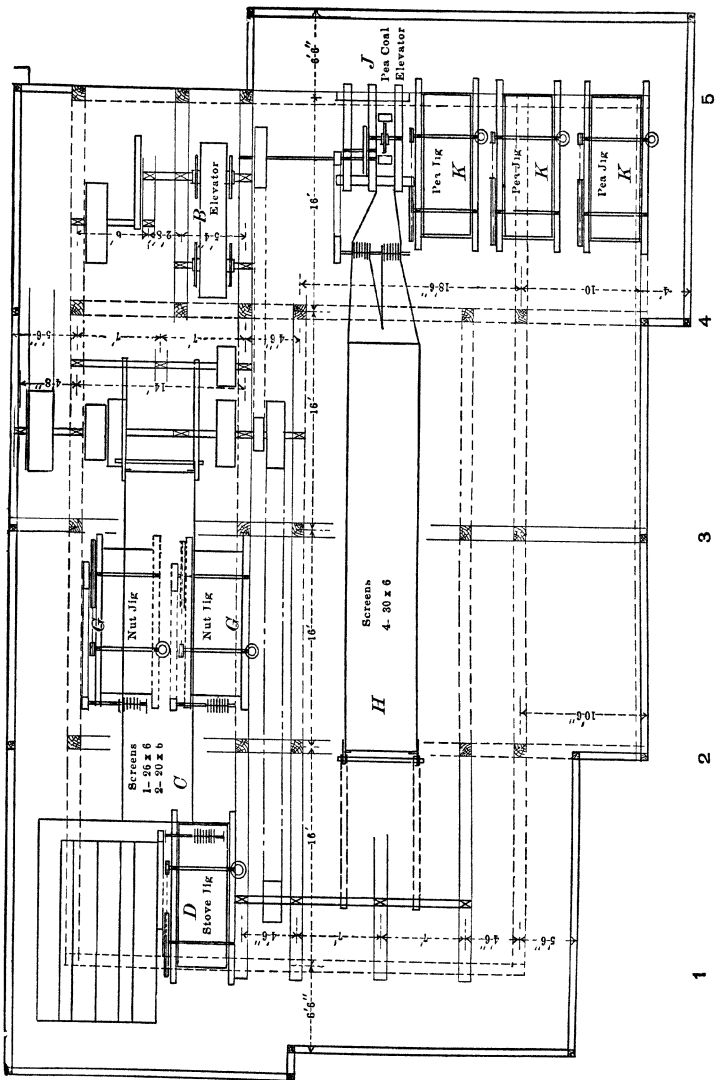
CAPOUSE WASHER—PLAN, SHOWING THE POSITION OF THE MACHINERY.
